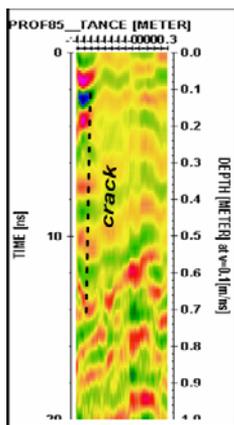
Interpreted GPR profile No.85 of the outside tower right side of elevator door.
